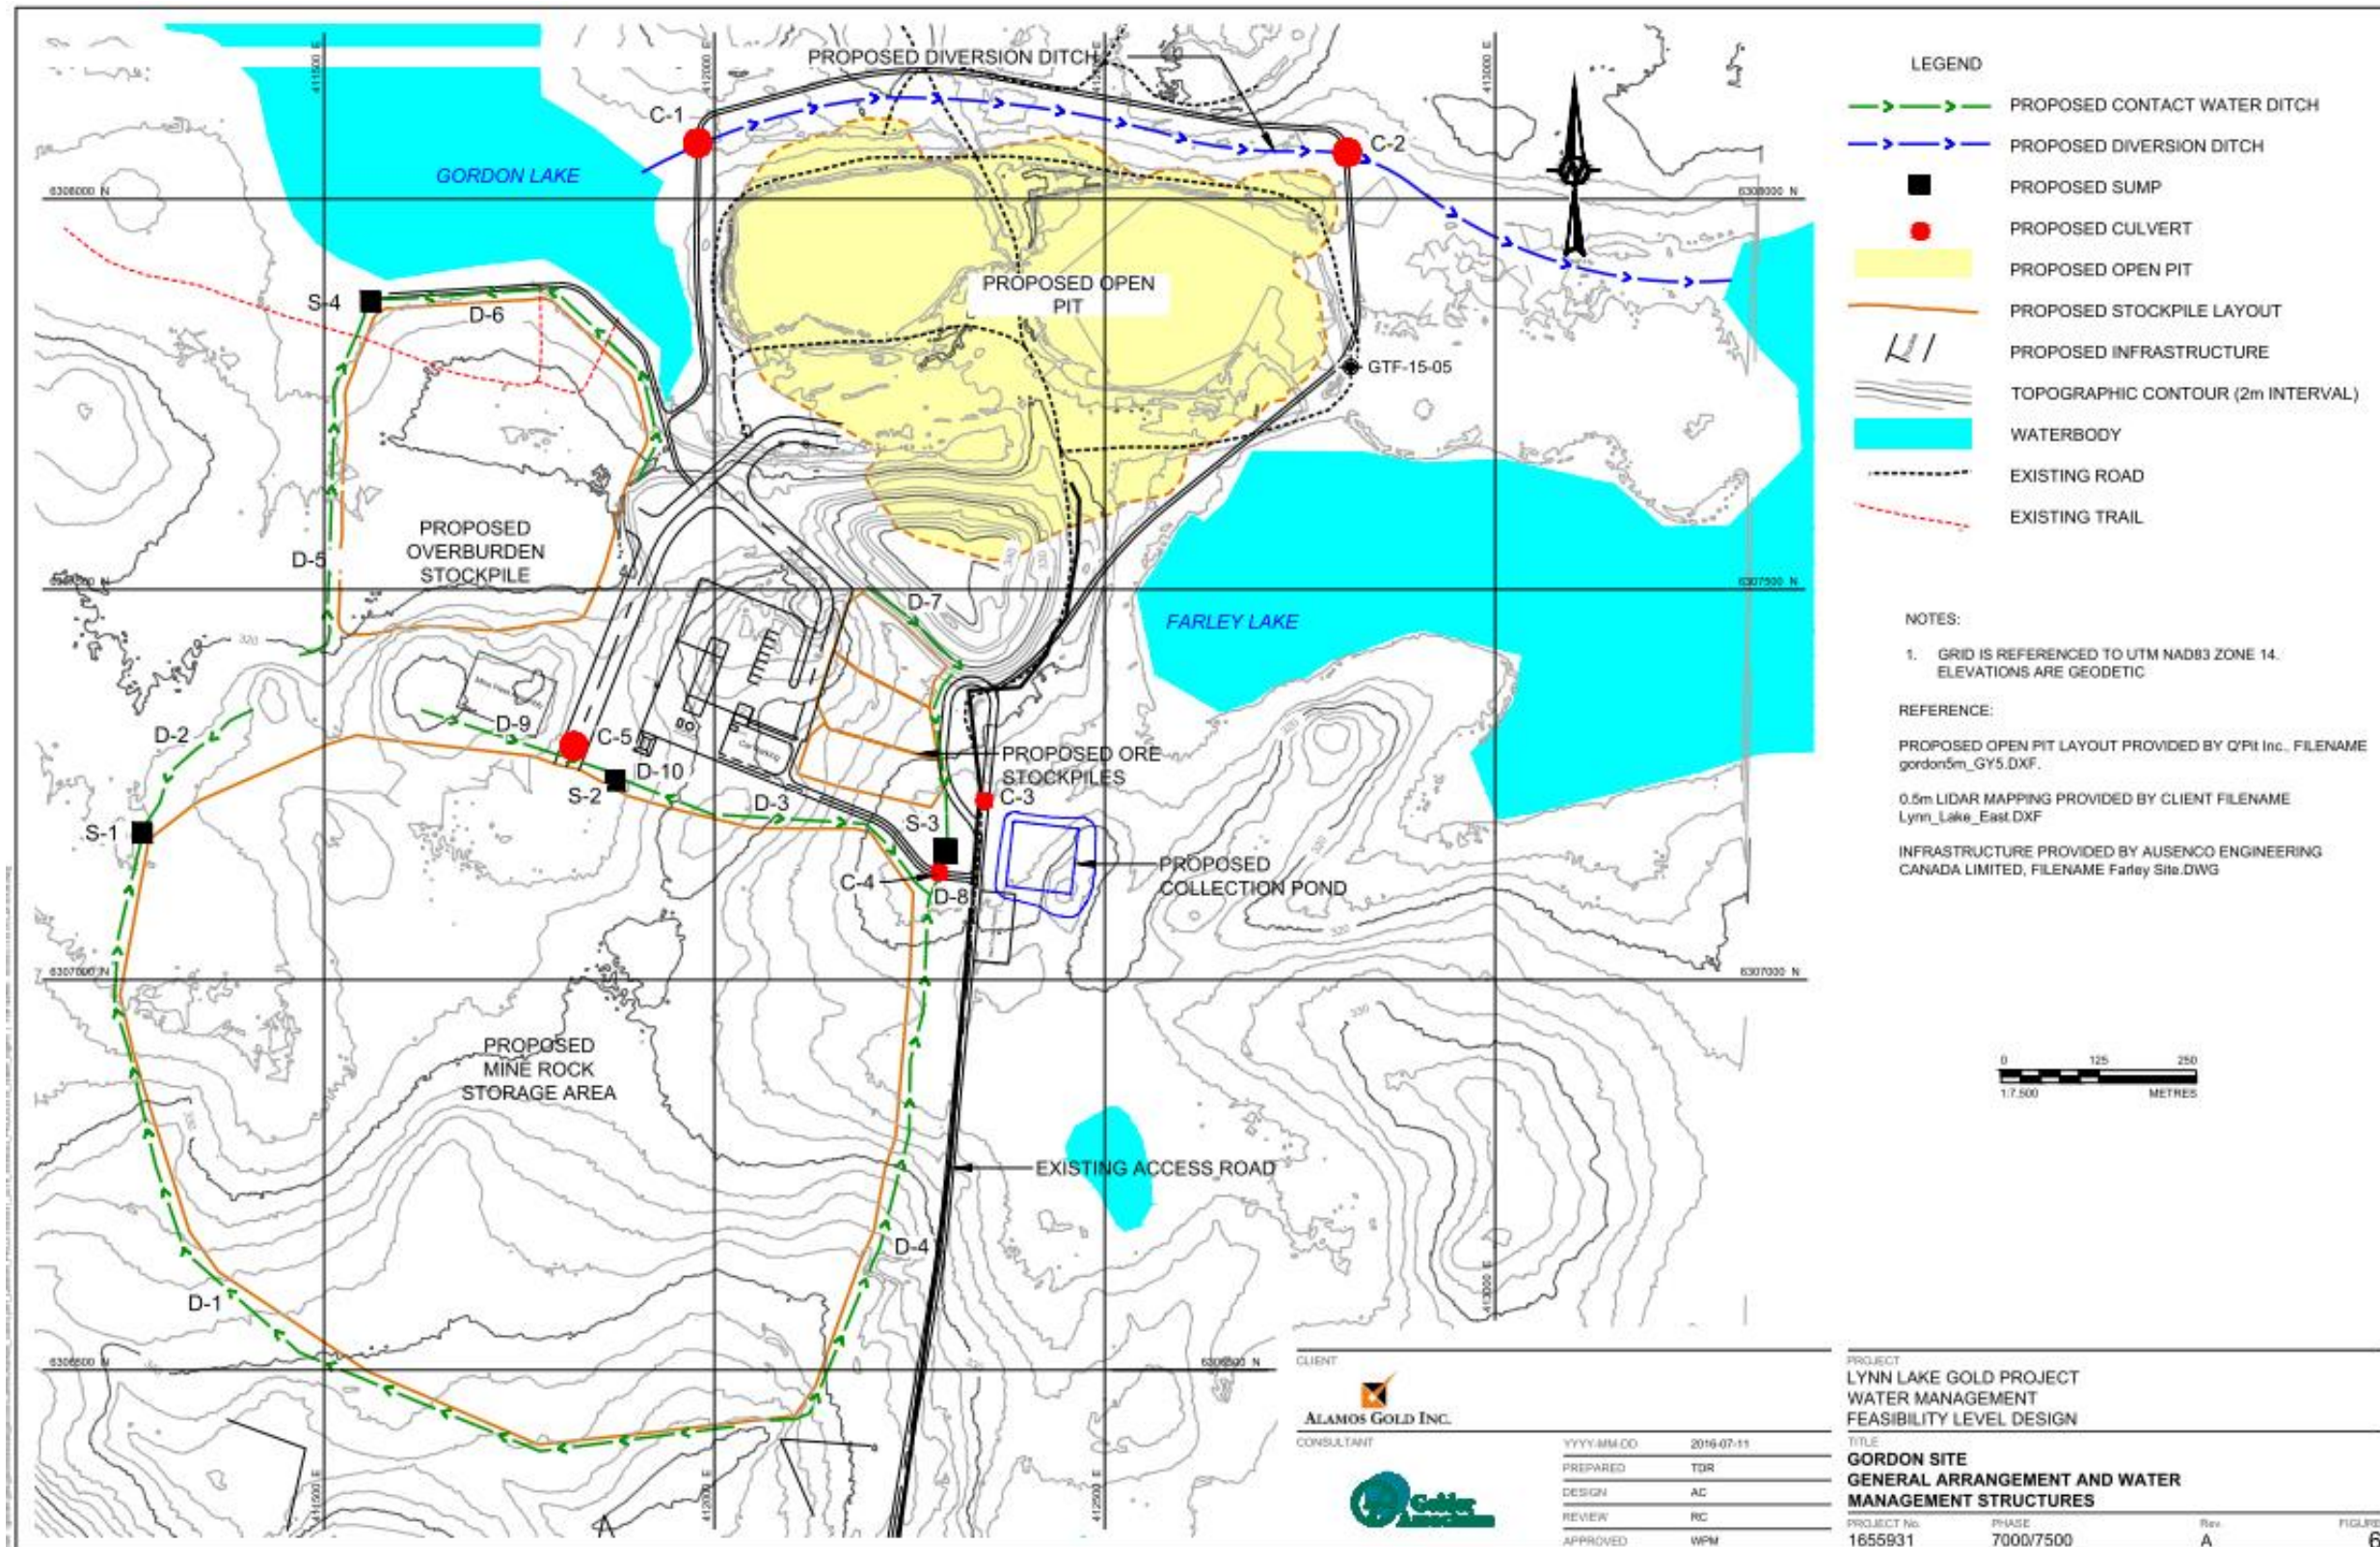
Gordon Site General Arrangement and Water Management Infrastructure
